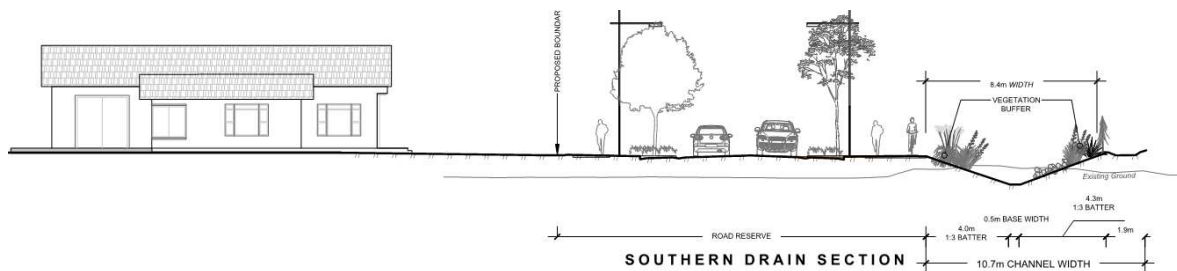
Proposed Ngarara Stream Cross Section 1400 – 1750m
